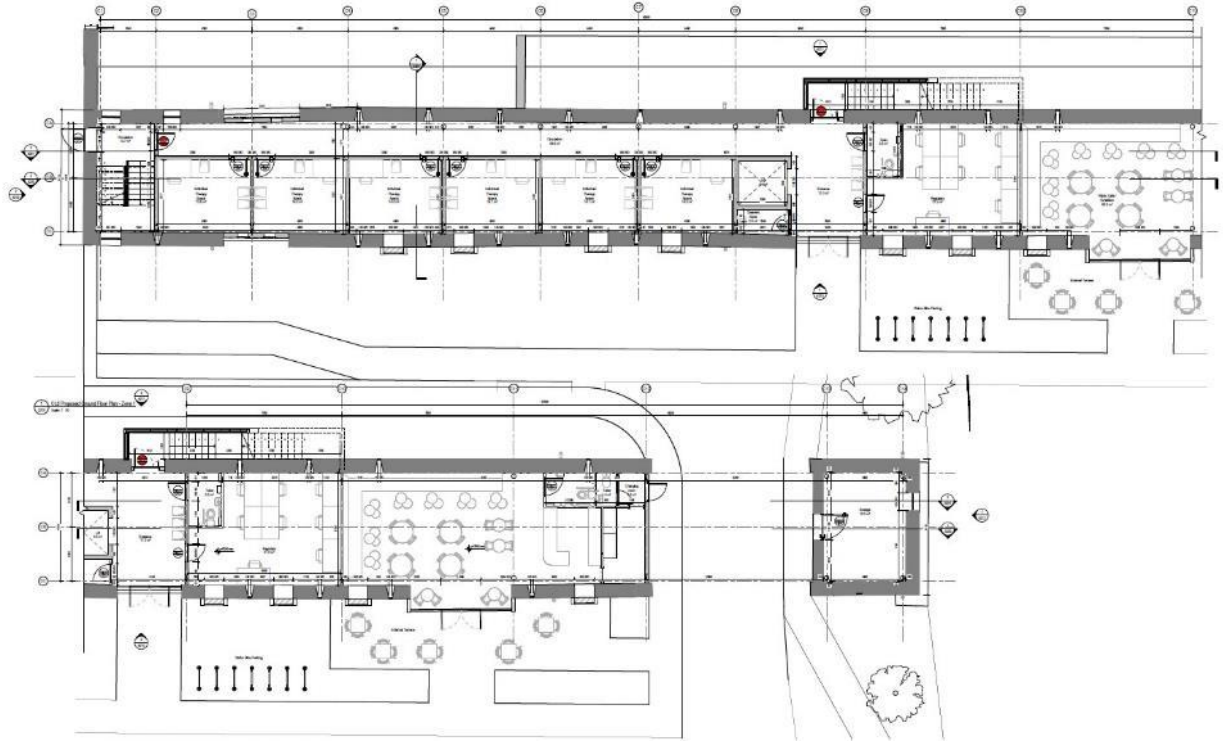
Proposed ground floor plan. Above: Part 1. Bottom: Part 2.
